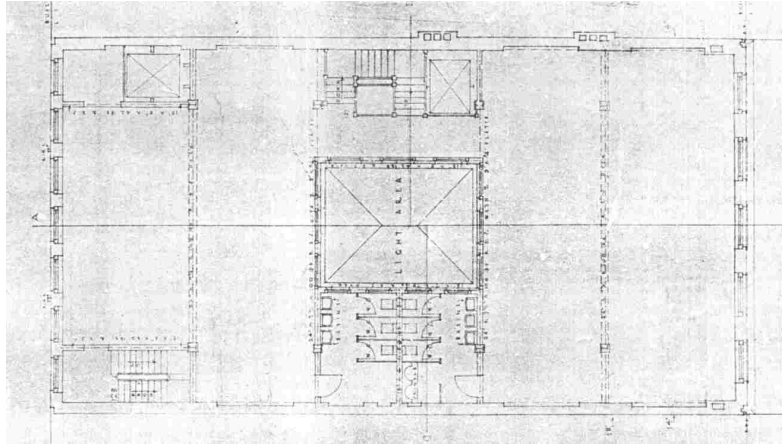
Plan of typical upper floor by Wilson, Neave and Berry, 1922 (Source: City of Sydney Archives, BA 74/22)
